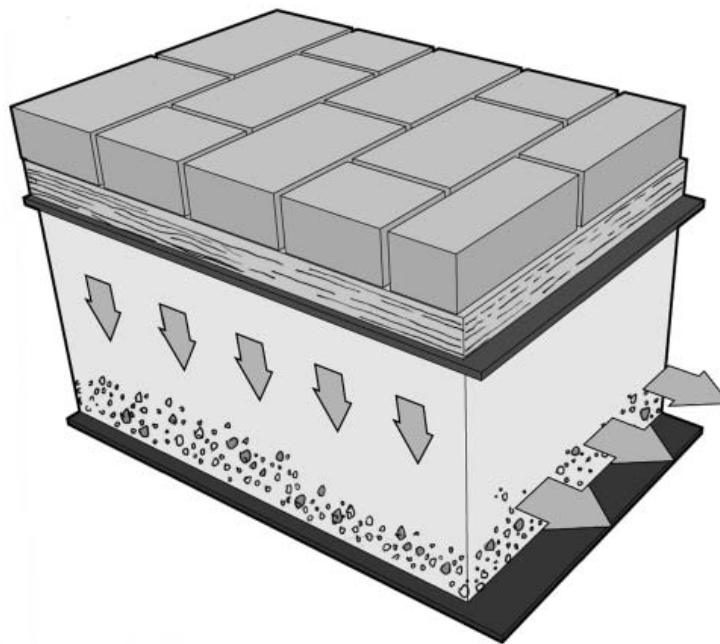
Permeable paving – typical vertical section. Source: adapted from Butler and Davies 2011.
